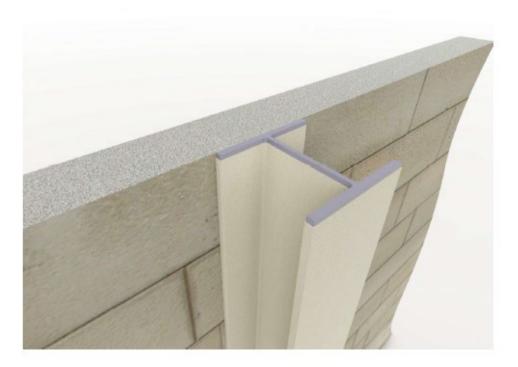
Nullifire SC901/902 protected steel column interfacing with masonry wall
